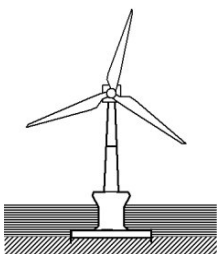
Gravitational foundation. Caissons are fabricated at the coast in a dry dock, towed to the planned location, then sunk to the ground and filled with sand and gravel
